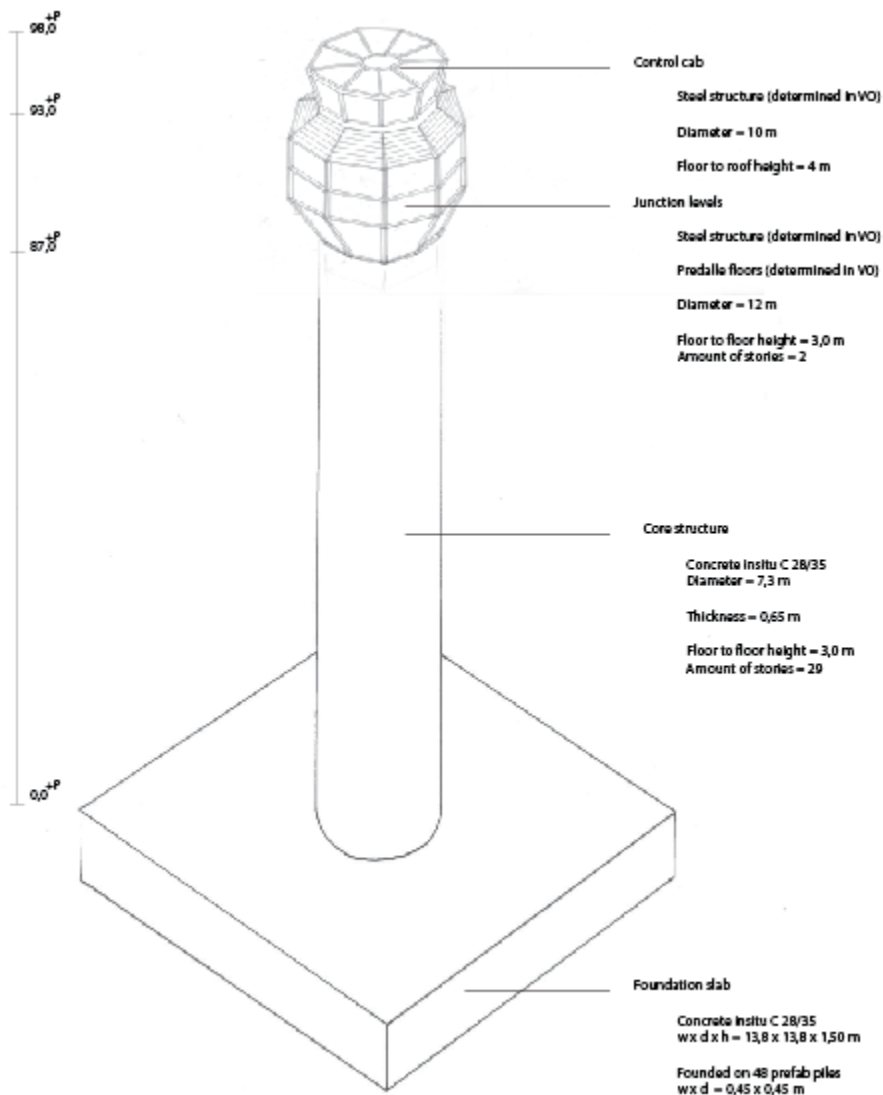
Concept design Nanjing airport, Concrete core in-situ
